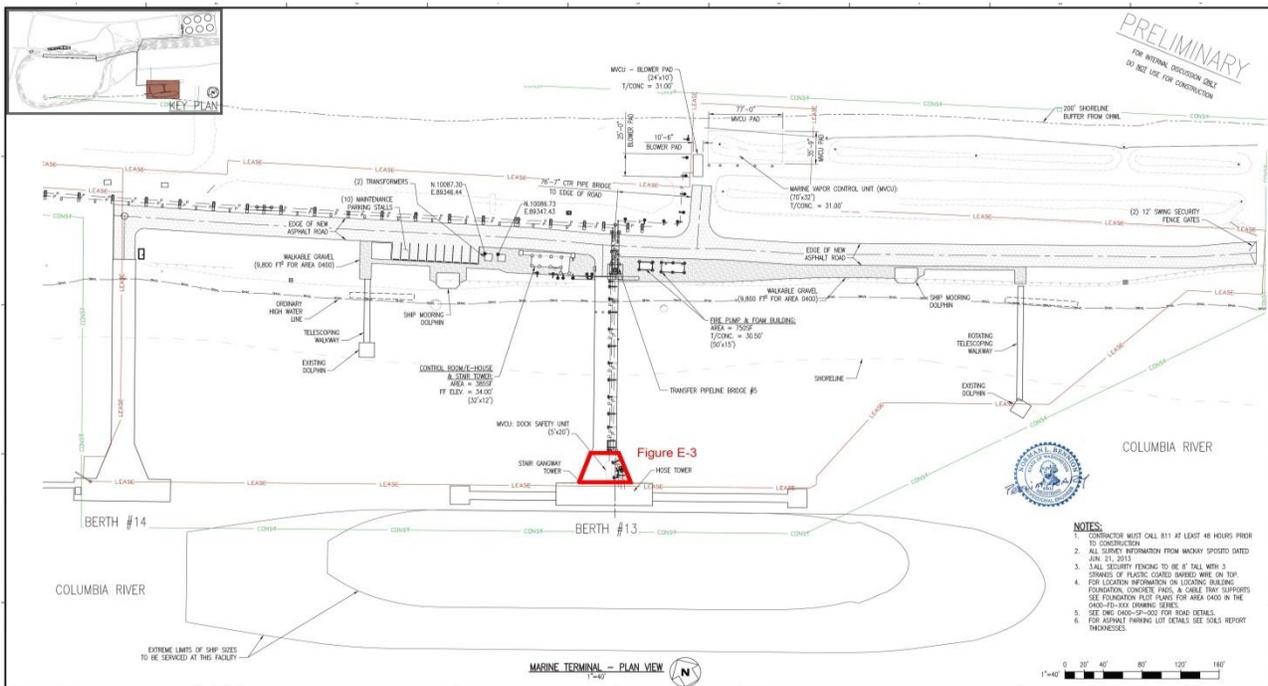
Figure B-3 on Marine Terminal Enlarged Plan View (Ref. (2))
